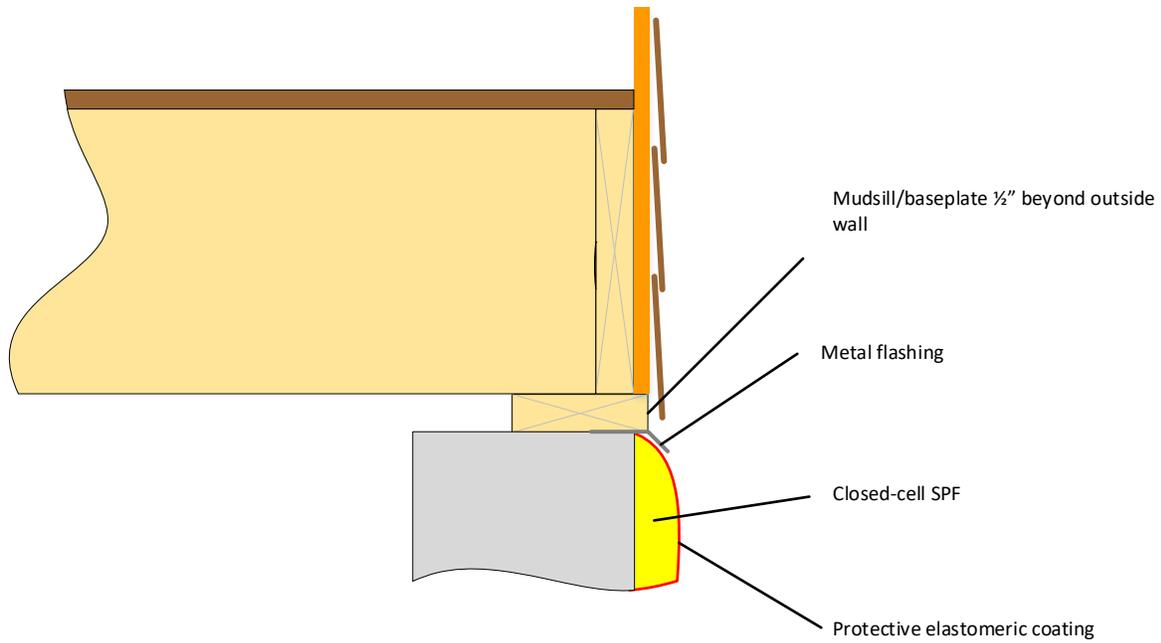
Detail of mudsill and flashing when SPF is installed just above grade
